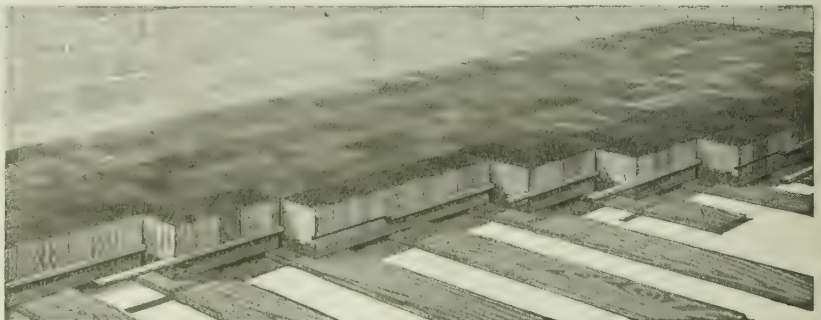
SHOWING INSTALLATION OF "BLOXONEND" ON FLAT STRIPS OVER NEAT CONCRETE
